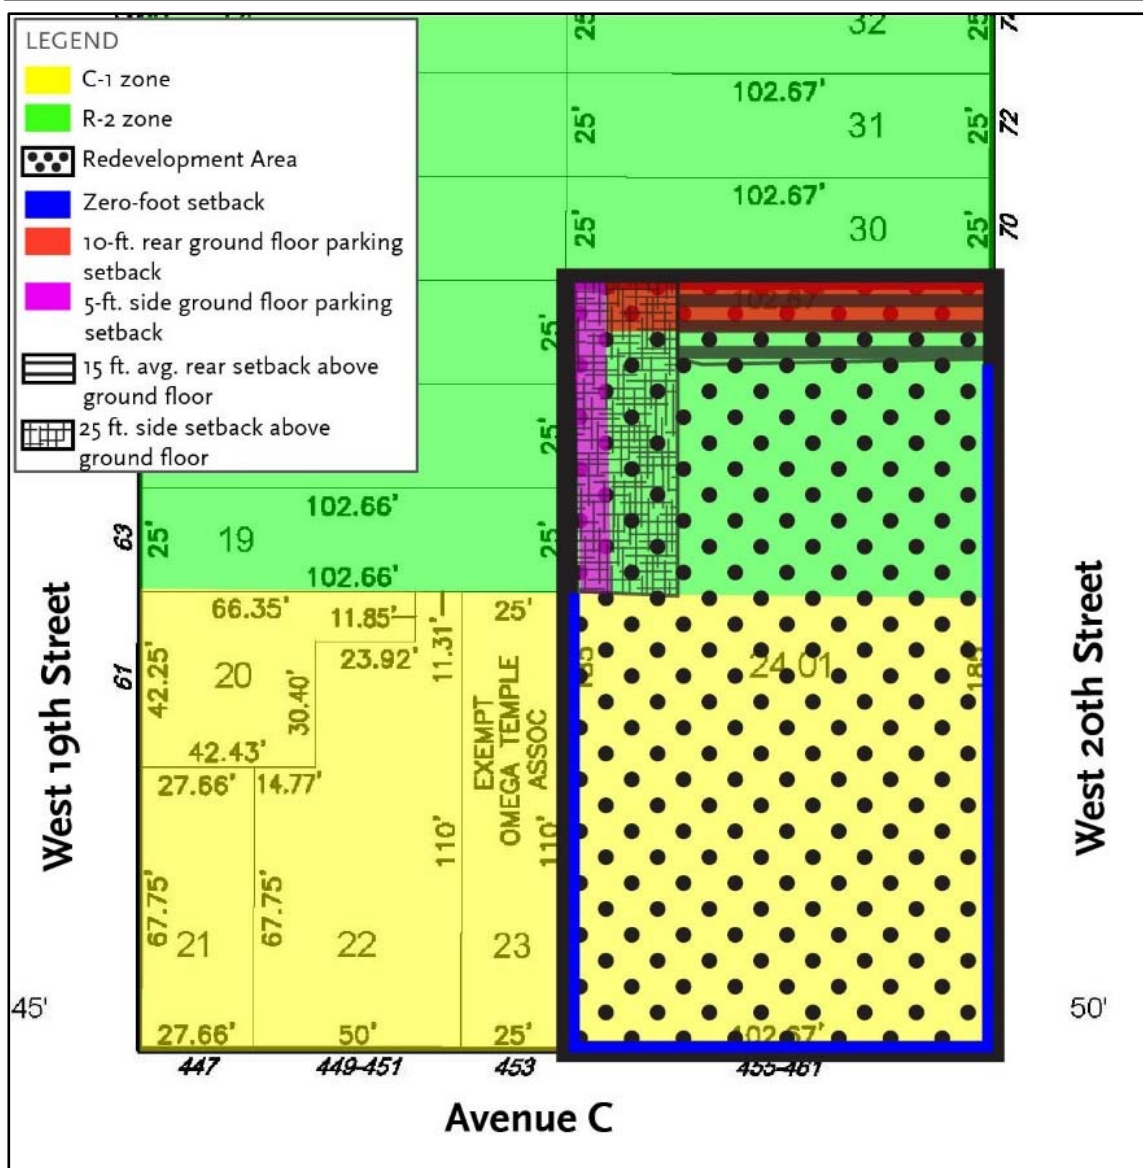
from the Redevelopment Plan Depicting the Required Yard Widths/Depths.
